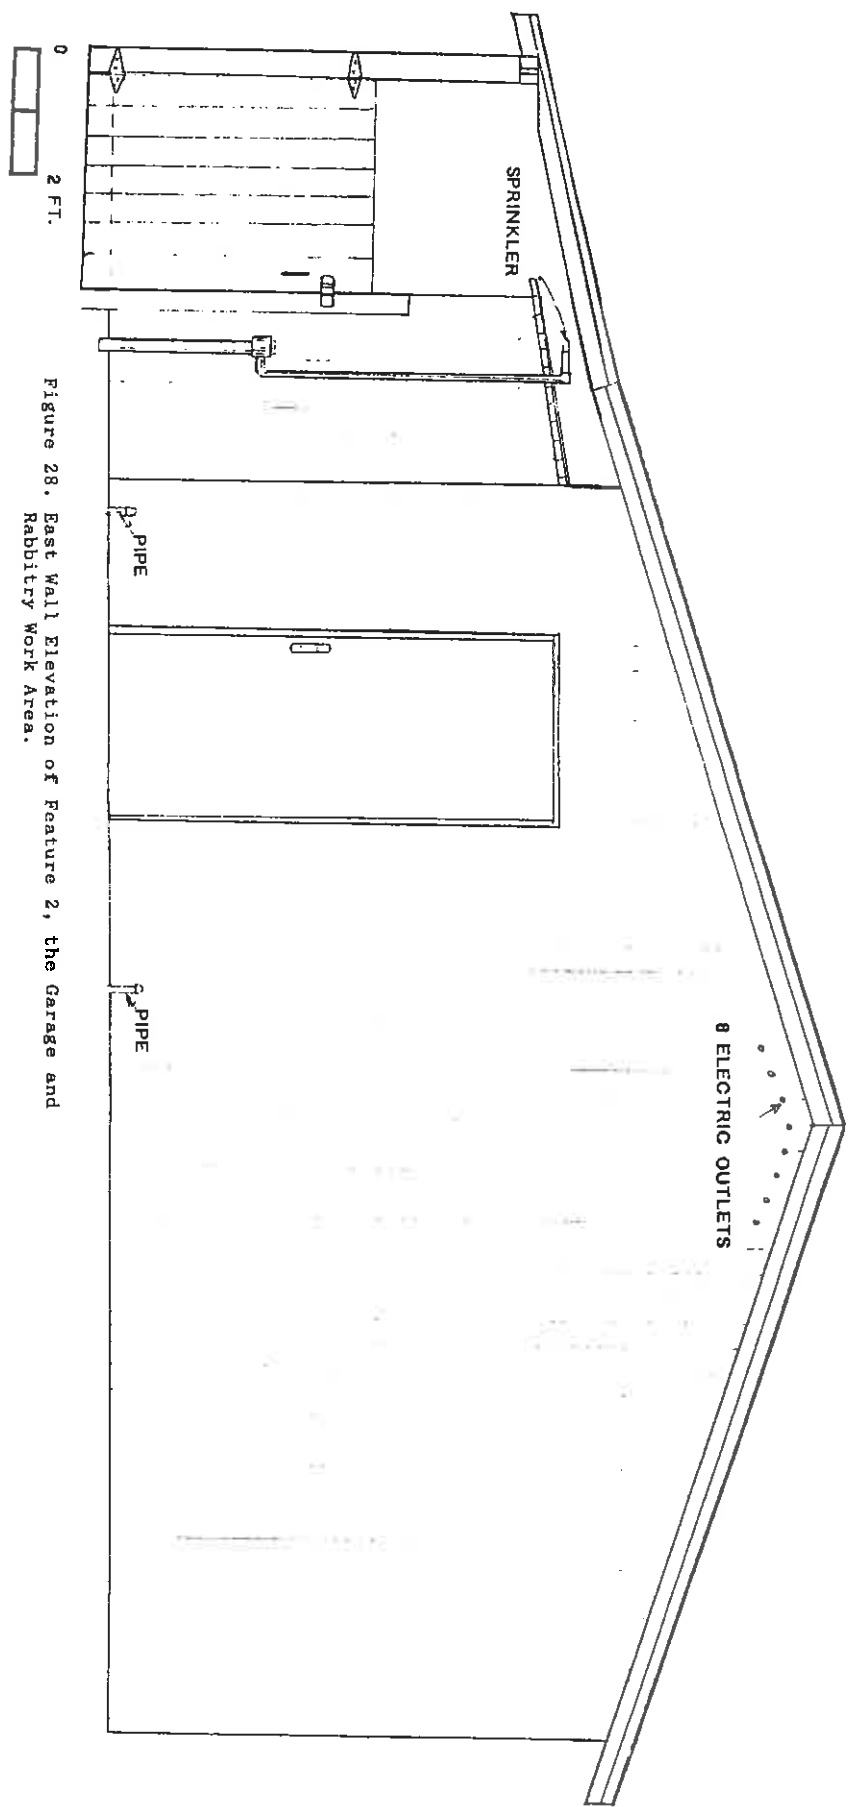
East Wall Elevation of Feature 2, the Garage and Rabbitry Work Area.
